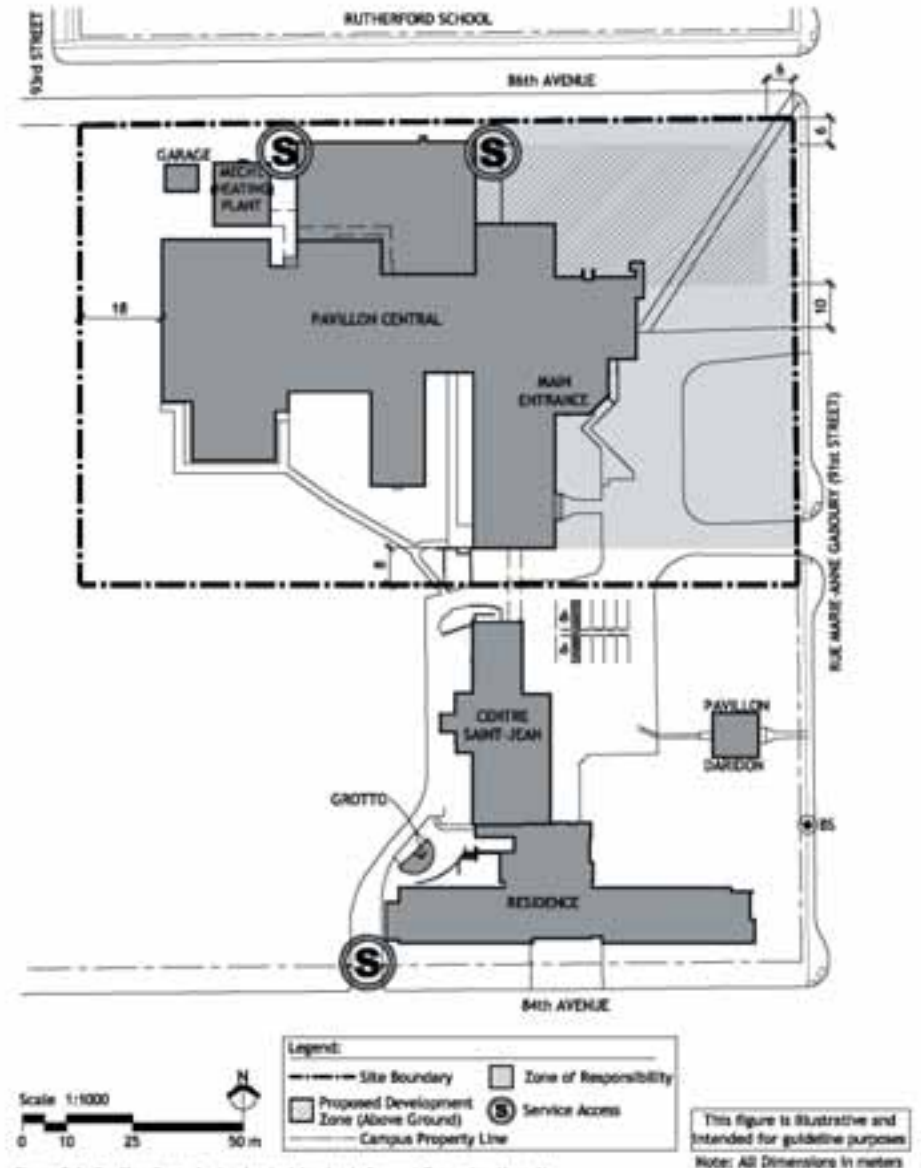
Pavillon Central - Academic / Academic Support Expansion (Area 1)
